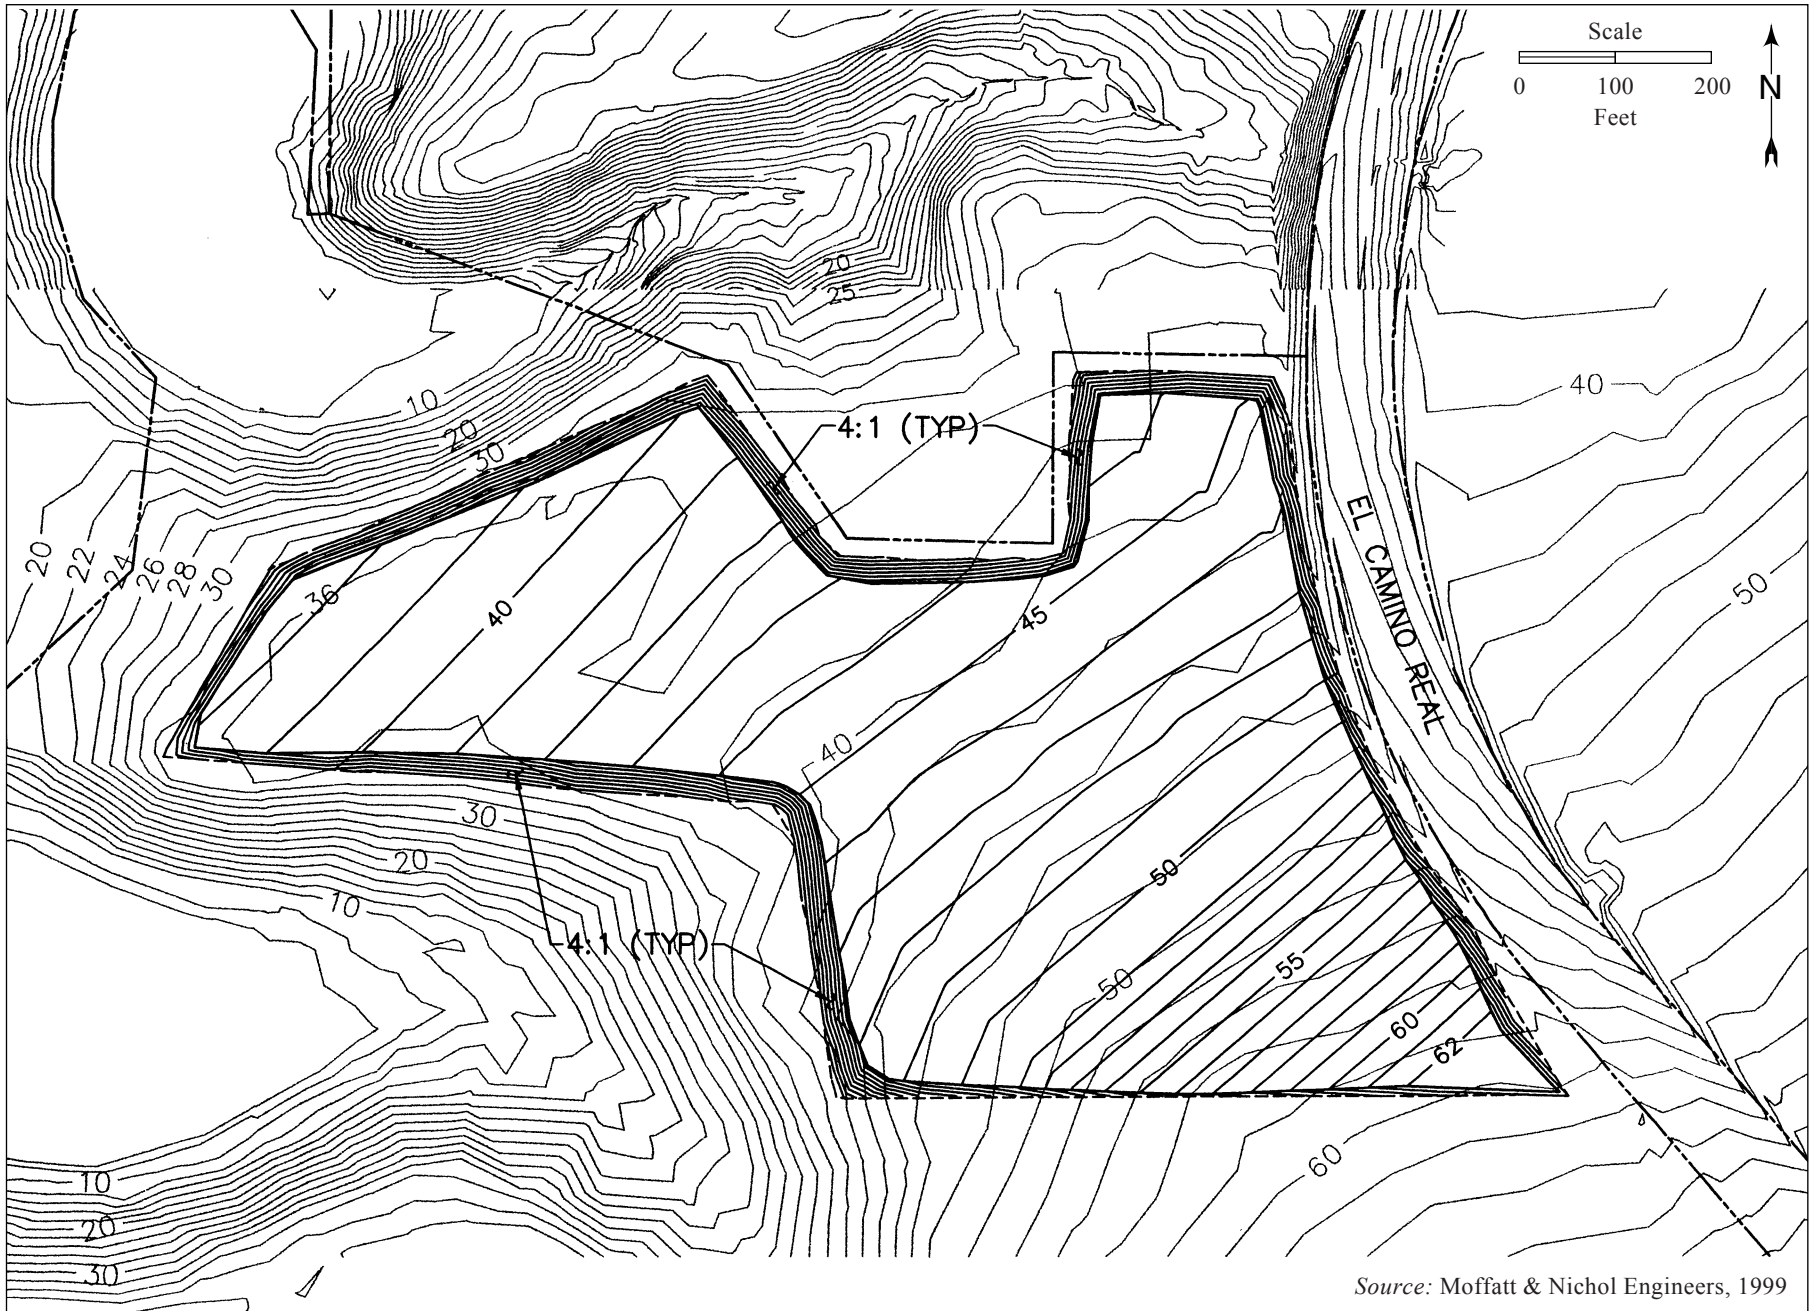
Disposal Site DS33 Grading Plan
